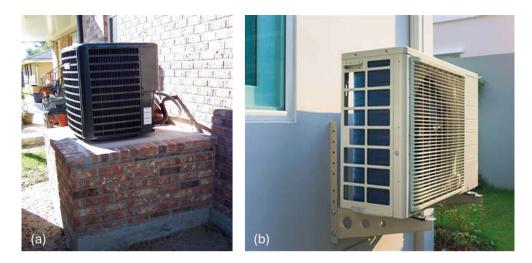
Air Conditioner Compressors Elevated (a) on a Pedestal, and (b) Using Wall Brackets
